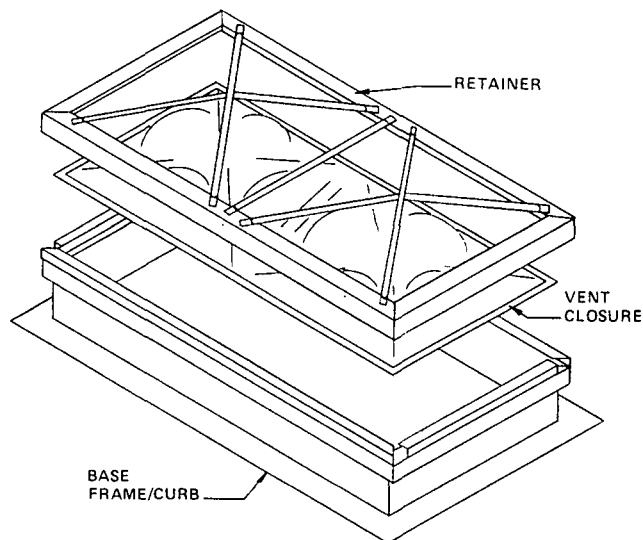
(a) Exploded view of manufactured vent closure.
